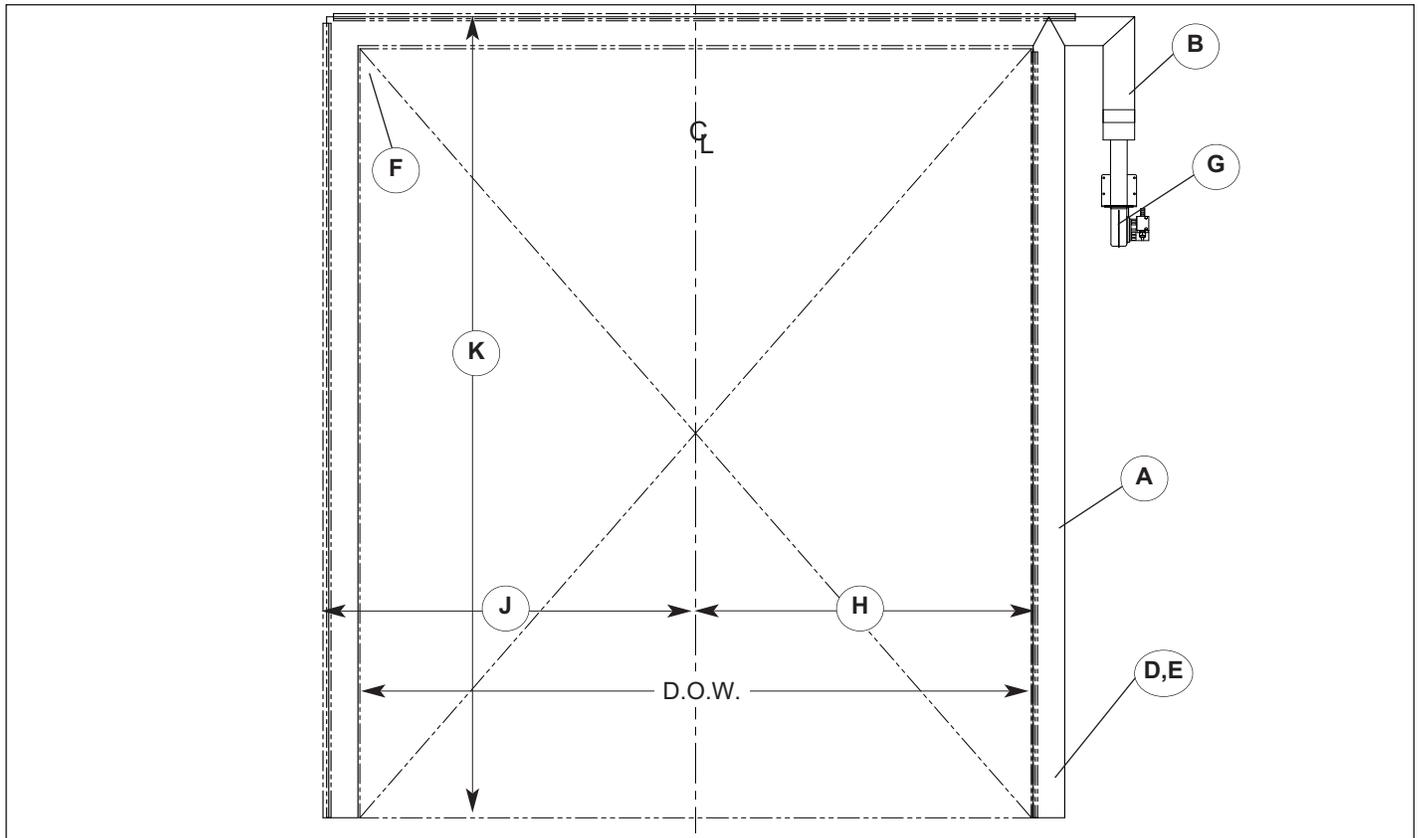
Right Hand Drive Shown: Right Hand Drive w/Left Hand Slide or Left Hand Drive w/Right Hand Slide
